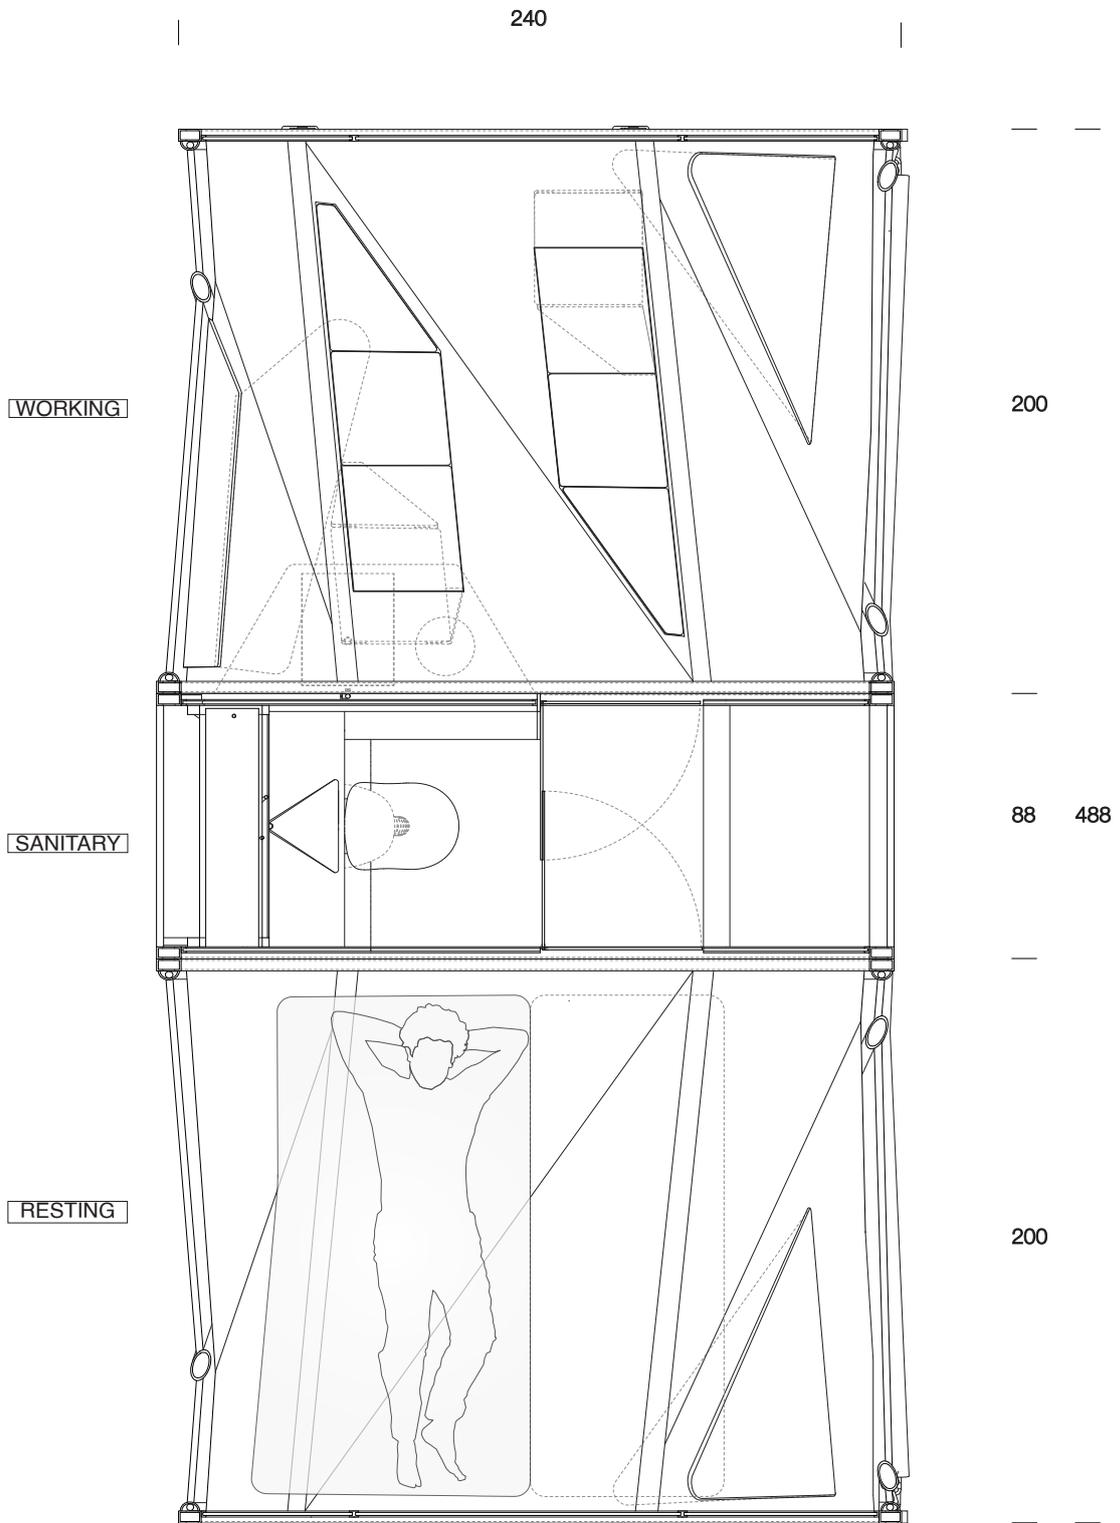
b) Floor plan - folding units attached to sanitary unit - collapsed state
